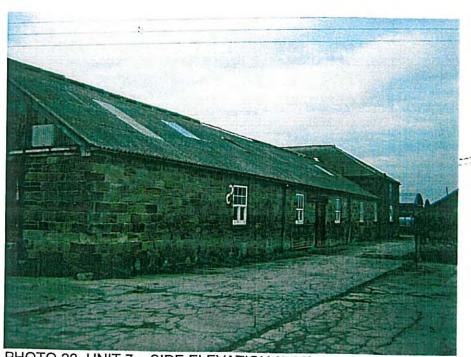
UNIT 7 – SIDE ELEVATION (3.08)
